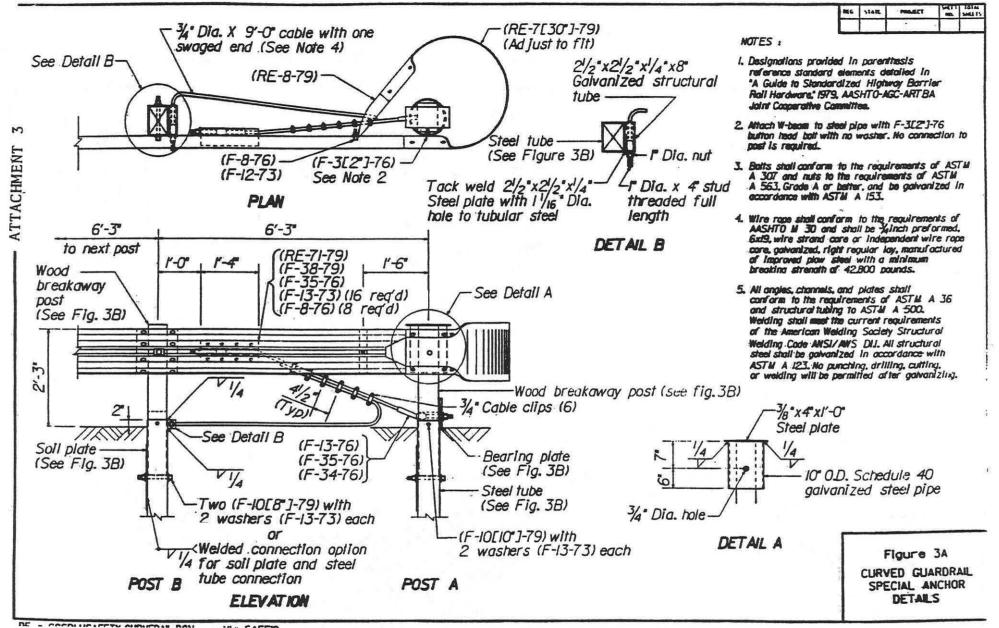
FHWA Technical Advisory Drawings for Short Radius Guardrail Designs (9)
